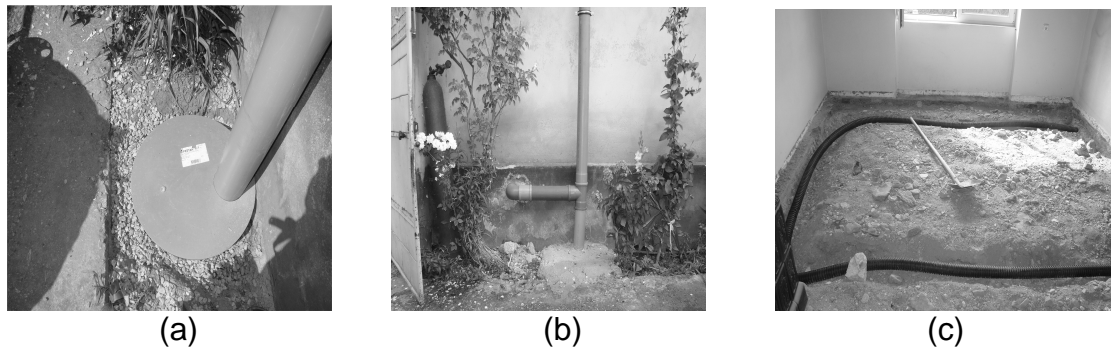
Soil radon collector near foundation (a); Pipe extraction connected to soil collector and to sub-slab extraction (b); Sub-slab extraction (c).
